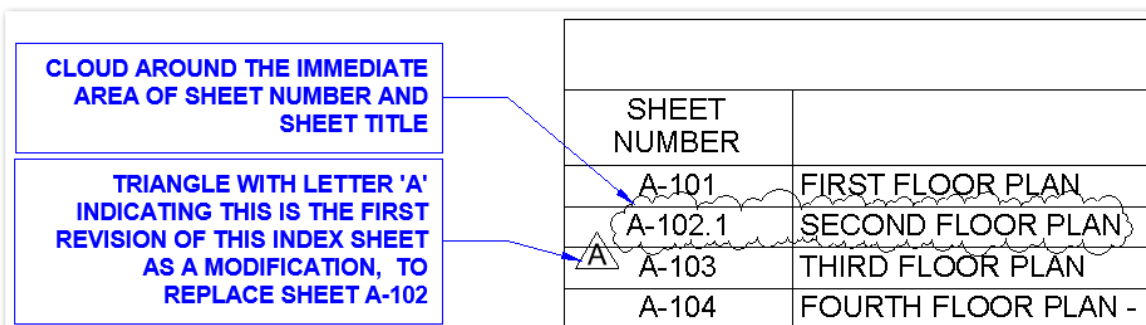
Figure D: Example Revision of Index of Drawings Showing Replaced Drawing
